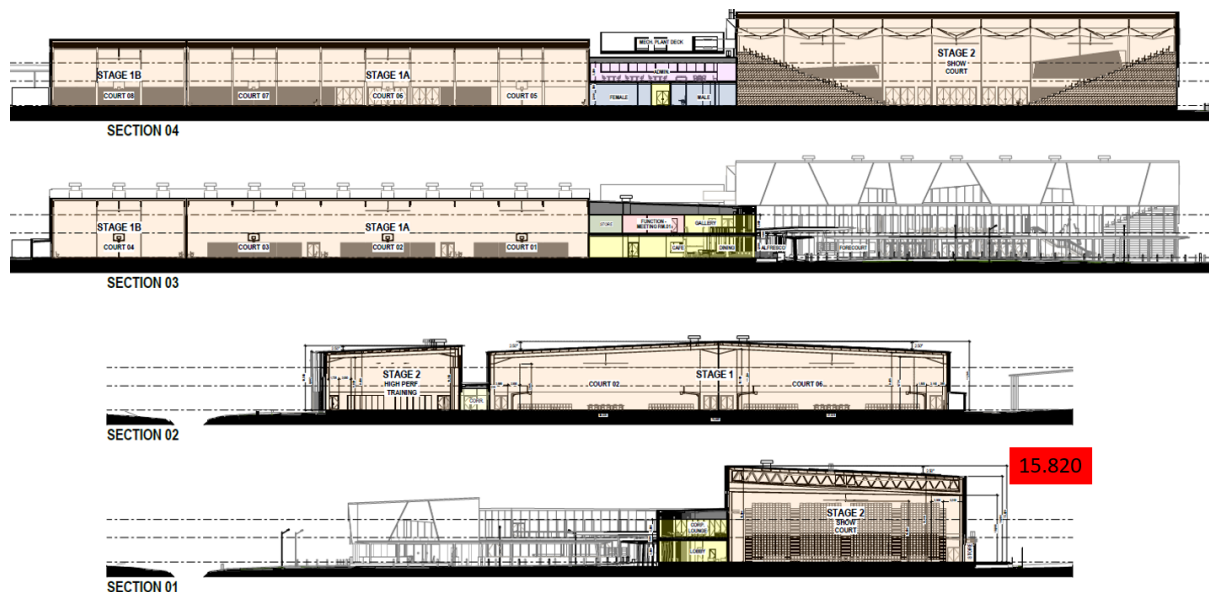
Buildings Elevation of the Proposed Hunter Indoor Sports Centre Development
